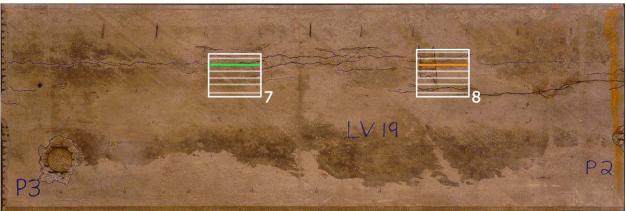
Location of 2<sup>nd</sup> Layer Punch outs on Beam LV19
